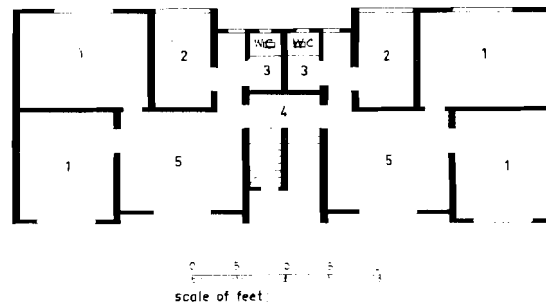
Singapore Improvement Trust (1954). Three-storey flats, Alexandra Road. Typical plan of a pair of flats, each with a floor area of 51.3 m². 1 bedroom, 2 kitchen, 3 bath, 4 communal stairway, 5 living-room.
